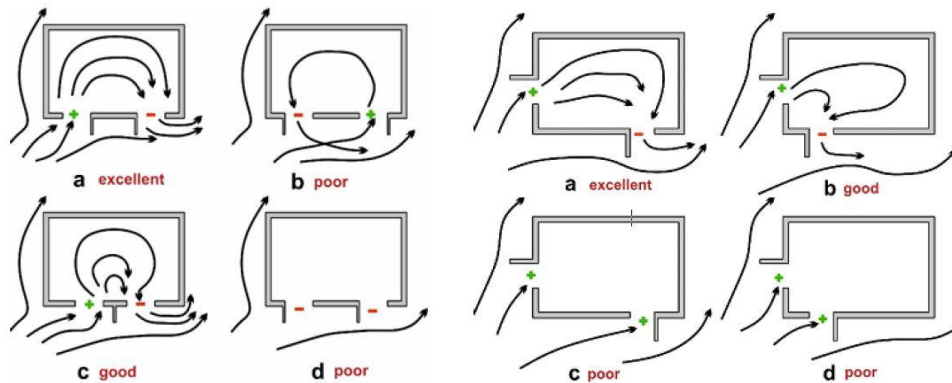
Effect of architectural elements(wing walls and parapets (Ahmed A. et al 2017).
